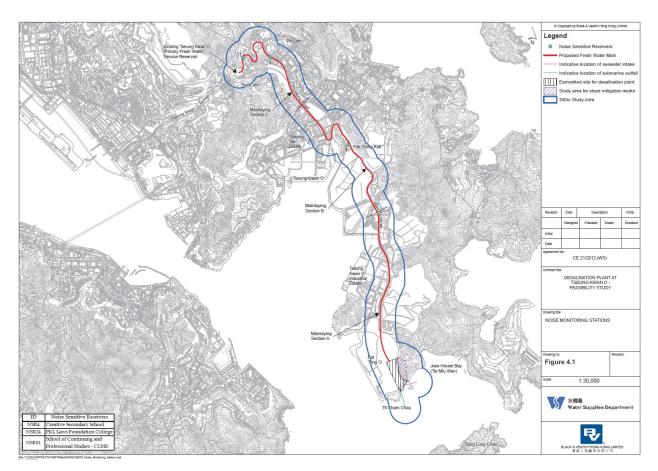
Site Layout Plan with Noise Sensitive Receivers and Desalination Plant
